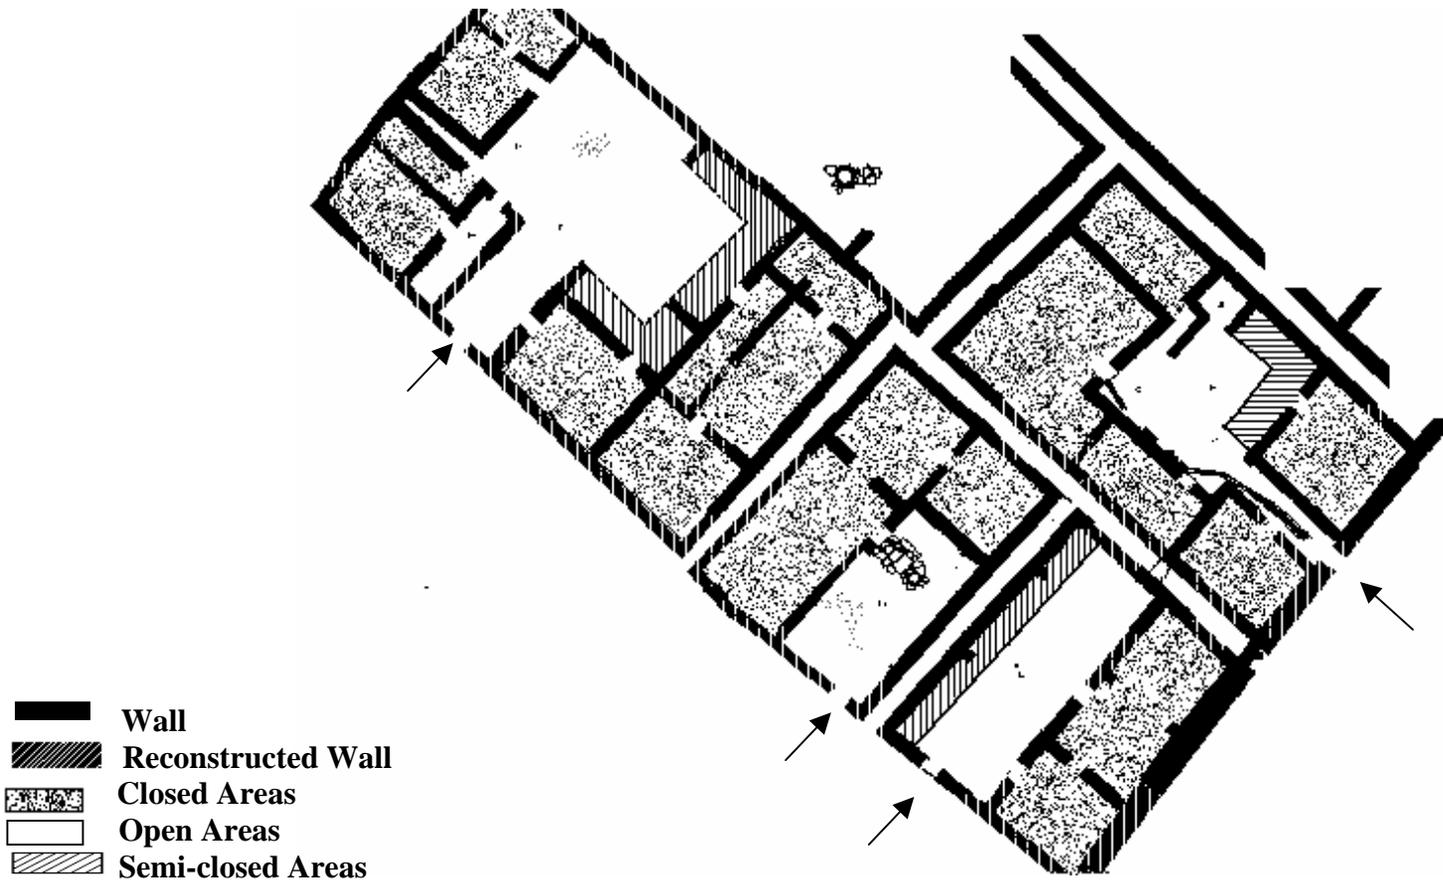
The Fourth century BC Plan Layout of Burgaz
